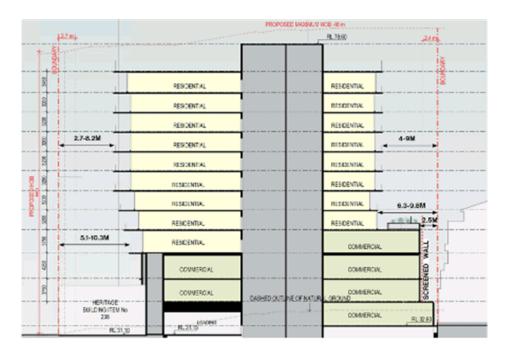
Indicative development concept for a 12 storey mixed use building (Source: Planning Proposal Concept Report, Group GSA 2021)
